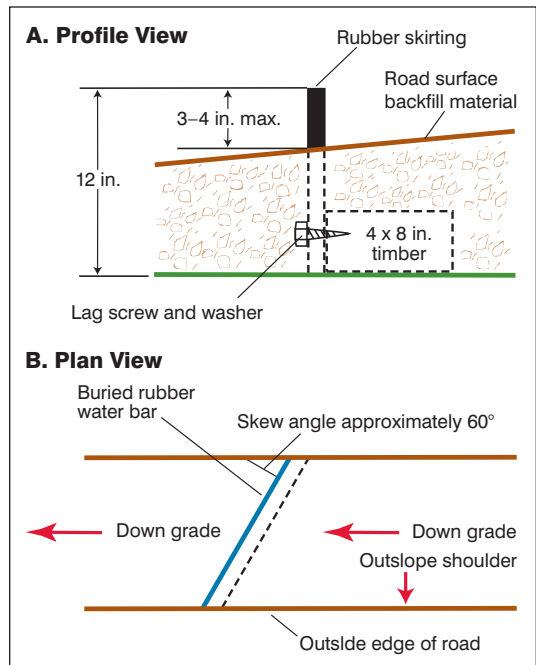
Installation specifications for rubber waterbar. Source: Brian Kramer
